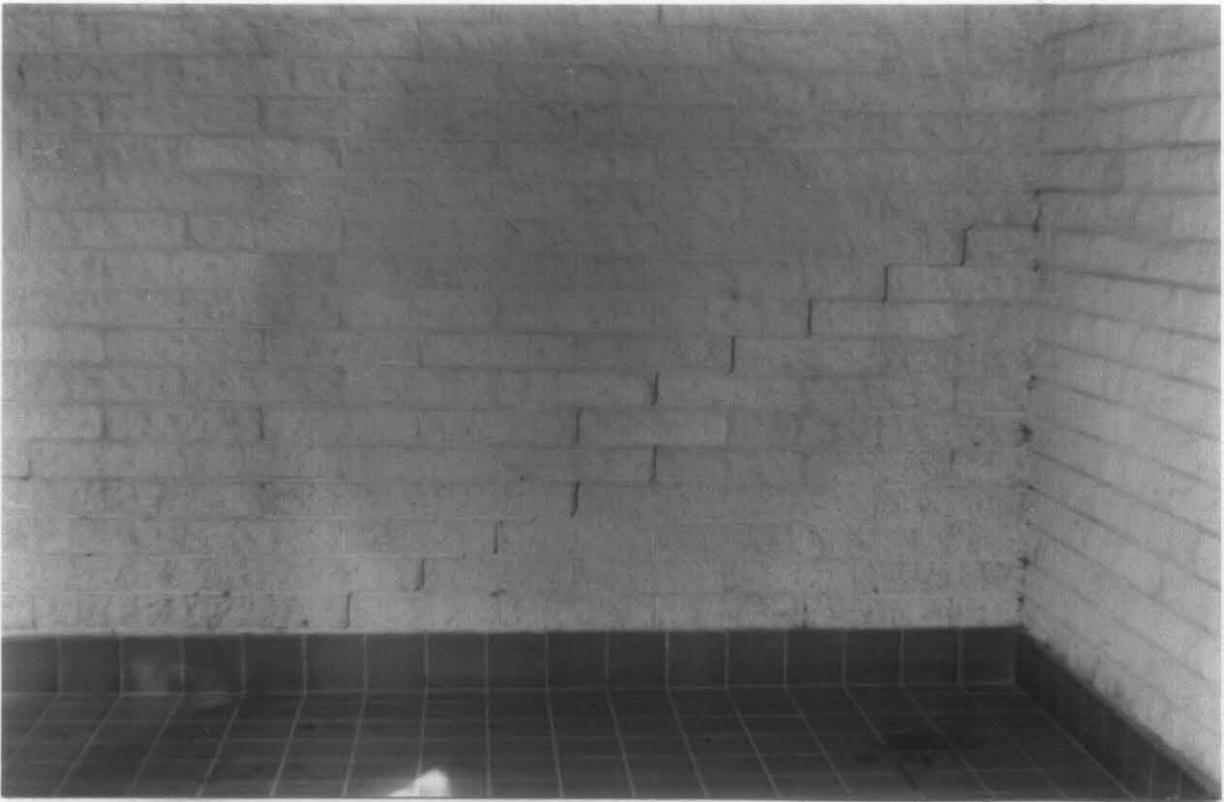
Cracking in brickwork of main building, possibly caused by foundation movements.
